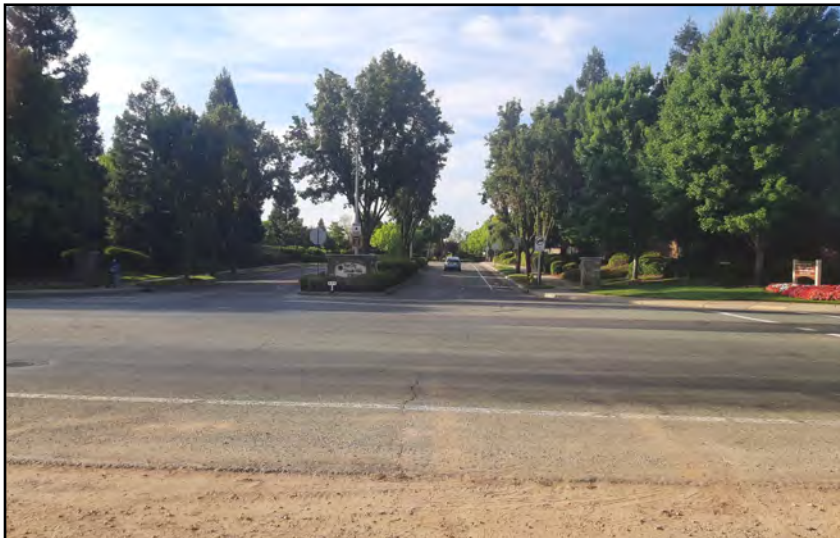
Intersection of Ferrari Ranch Road and Sun City Boulevard, Facing Southeast. Photo Taken August 1, 2024.
